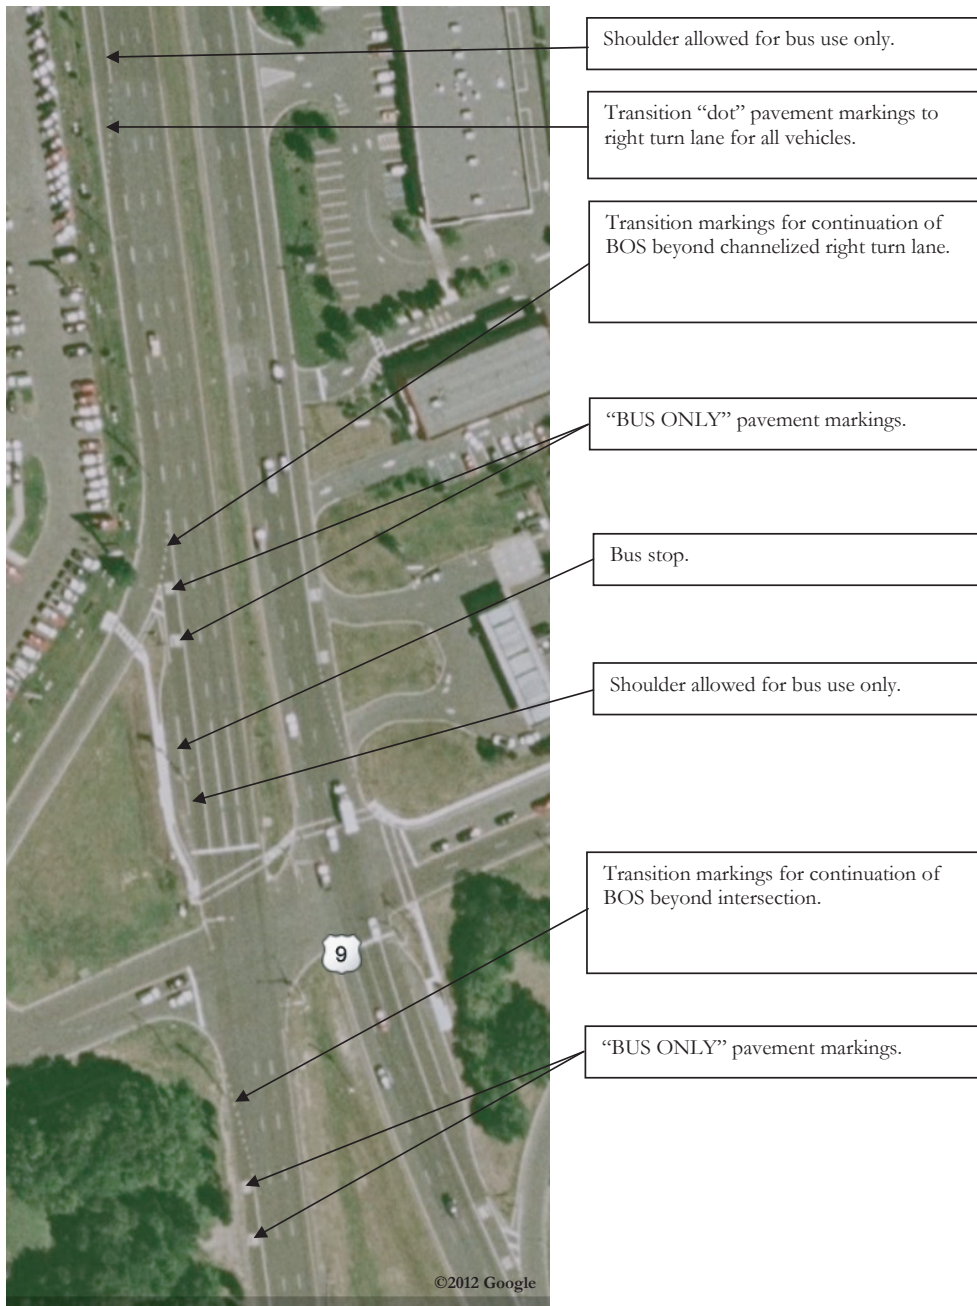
Example of arterial BOS pavement marking scheme. US-9 at Spring Valley Road, Old Bridge, New Jersey.
